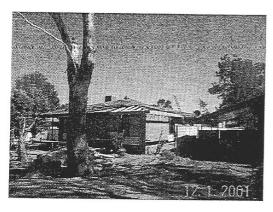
Debris damage to roof cladding and structure from fallen tree branch (Myall St)
